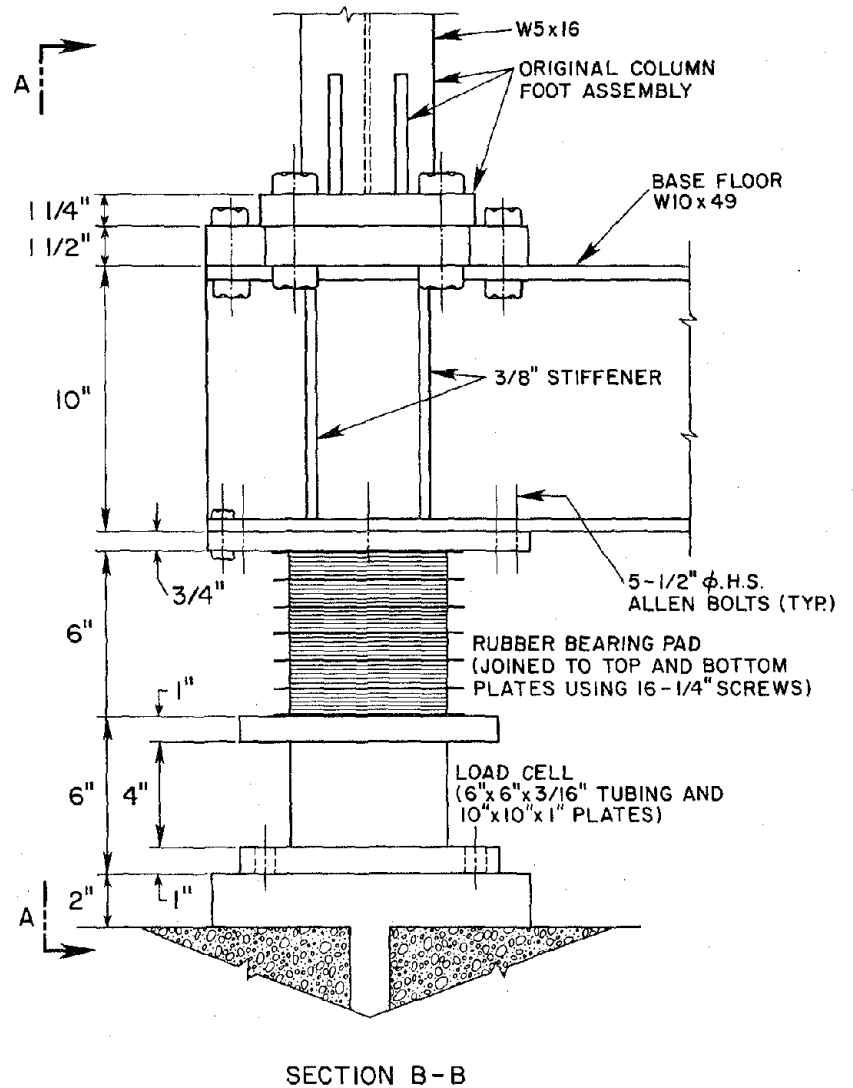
RUBBER BEARING CONNECTION - DETAIL
